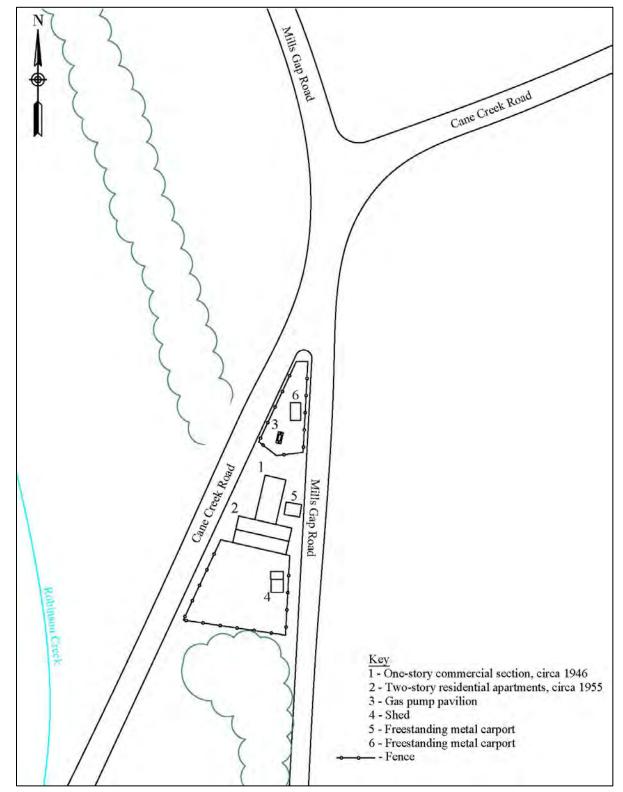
Site plan of the Meadow's Store and Apartments property (BN6343).
